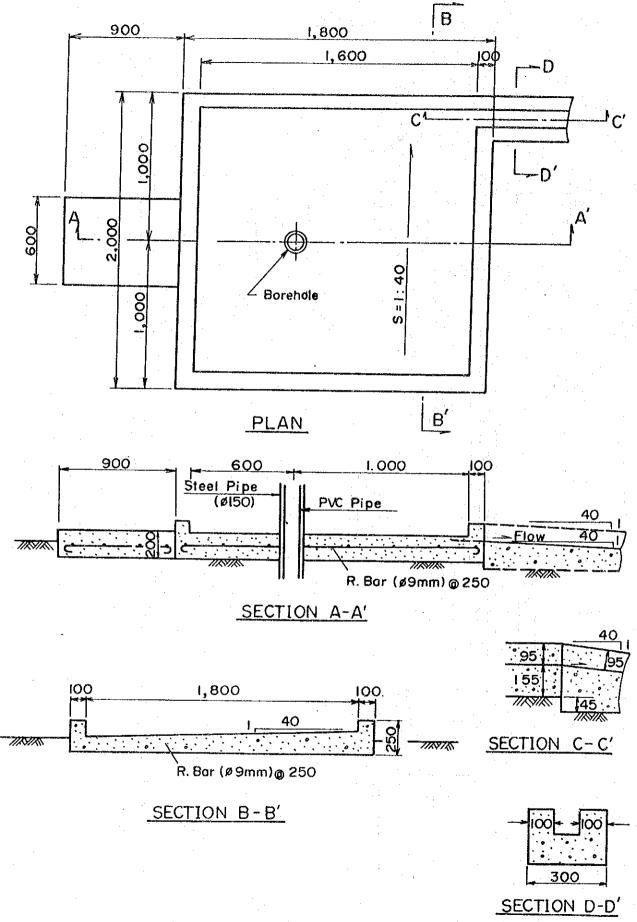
CONCRETE SLAB DESIGN OF BOREHOLE
